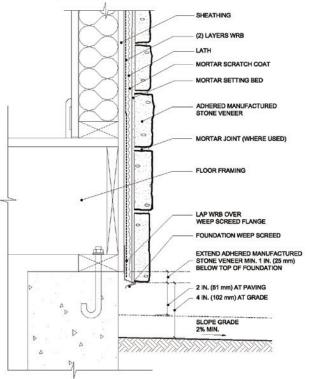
FOUNDATION WALL BASE-AMSY OVERLAPPING FOUNDATION
